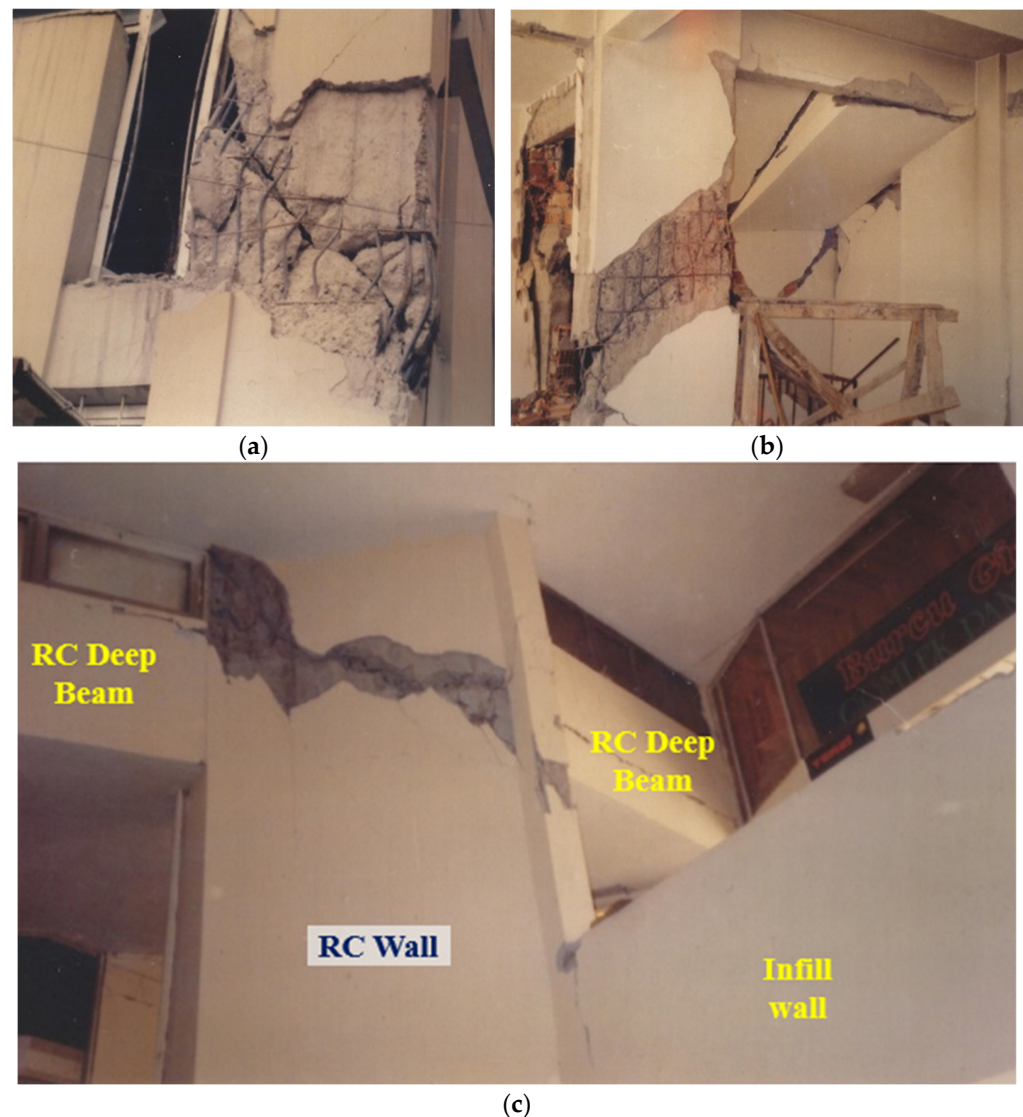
Examples of shear wall damage observed in reinforced concrete buildings in Erzincan Province following the 1992 earthquake: (a) shear cracking associated with short-beam effects, (b) diagonal shear cracking near RC beam–wall intersections, and (c) local crushing and cracking damage in RC deep beam–shear wall regions interacting with infill walls.
